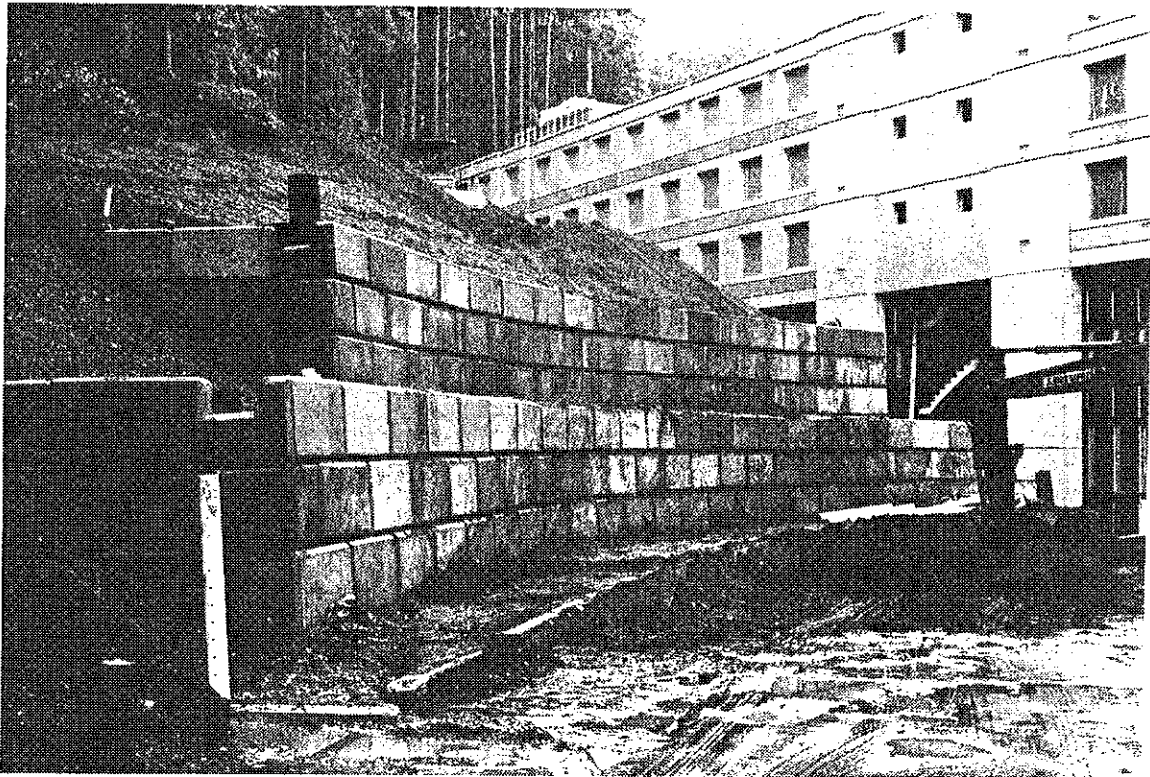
North End of Site With Soil-Nailed Wall,
